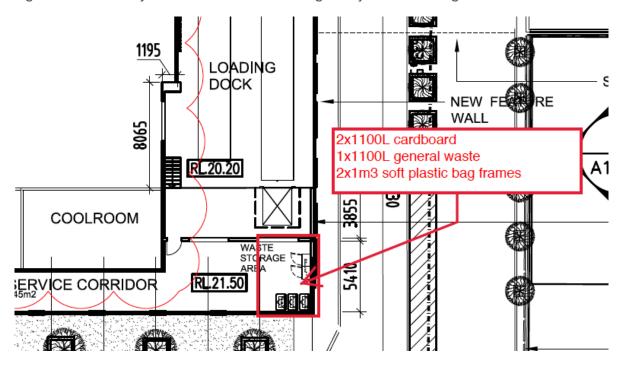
Indicative layout of additional waste storage – adjacent to loading dock
